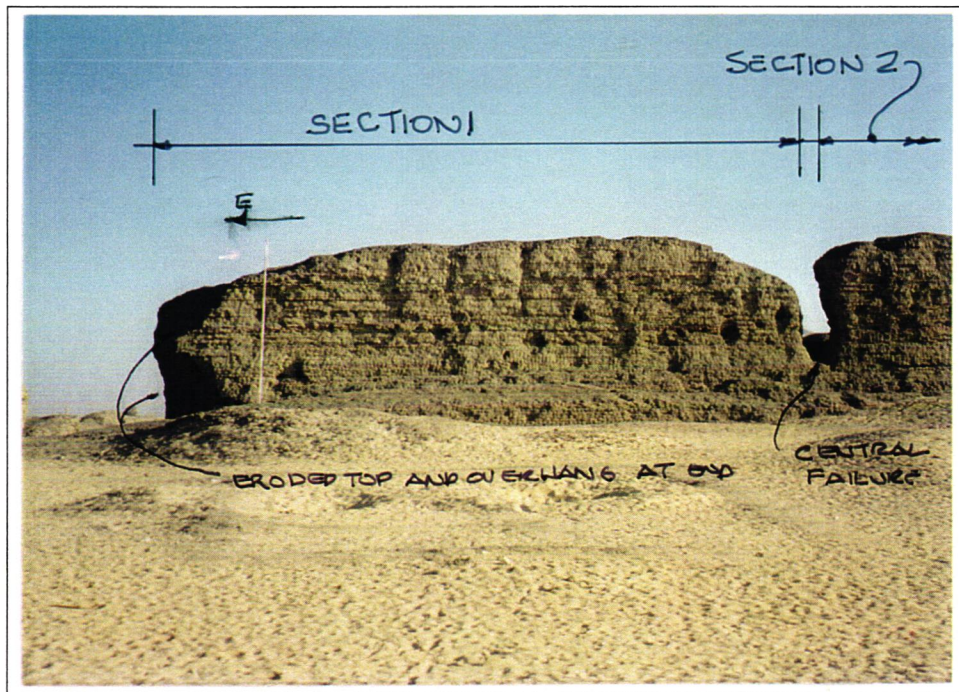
Cavity 2 West Main Enclosure Wall
